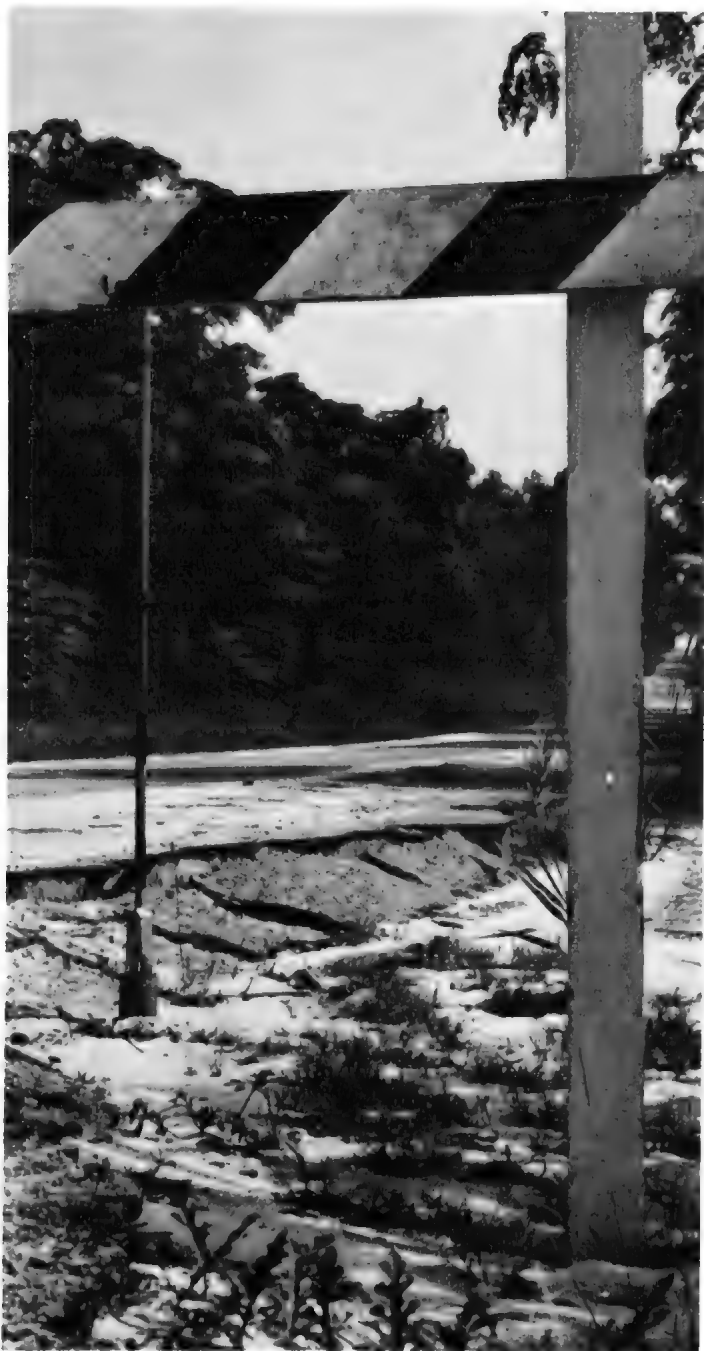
Erosion of fill material caused failure of this road on Dothan loamy sand, 2 to 6 percent slopes.
